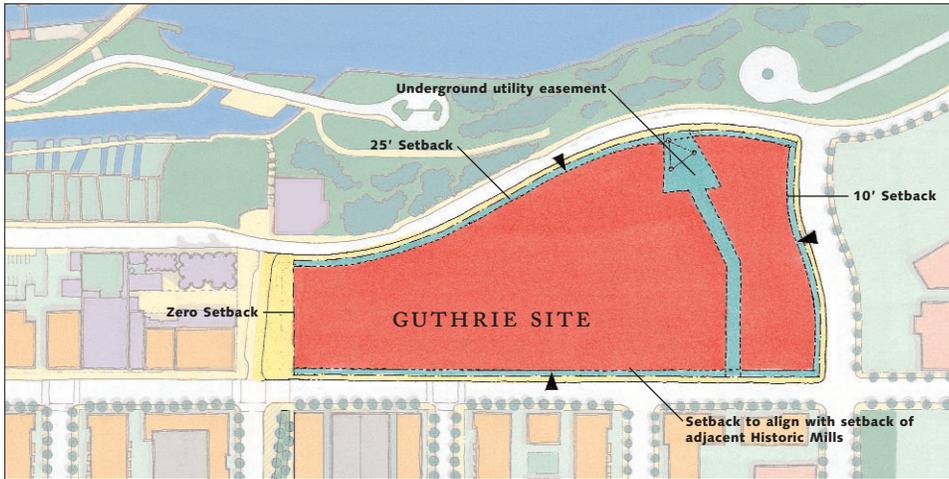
Minimum Required Set Backs from public right-of-way: An element of the future design, not necessarily structural, should attempt to frame the view looking up Chicago Avenue to the river. The building's west facade should define the plaza so that in conjunction with the Washburn A Mill, the view to the river is adequately framed.
